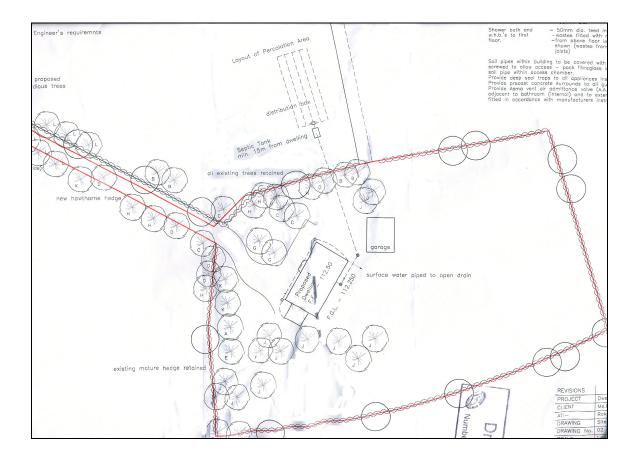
Architect's plan showing proposed location of development (15 Rakeeran Road not in plan but to north of development along concrete road)
